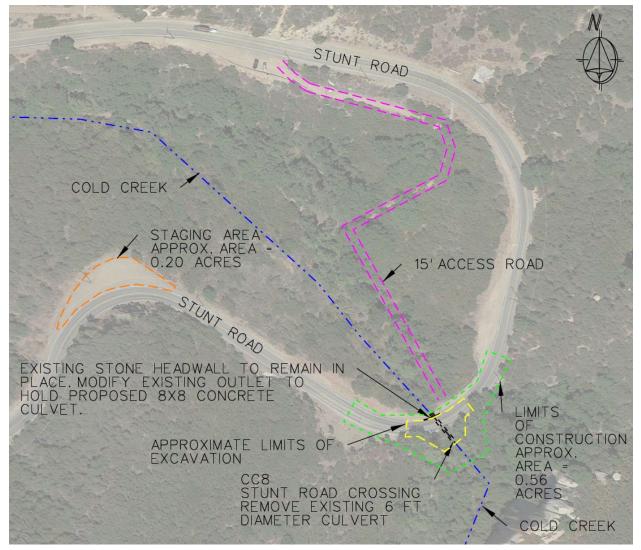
CC8, Stunt Road Crossing Schematic Design Part A
